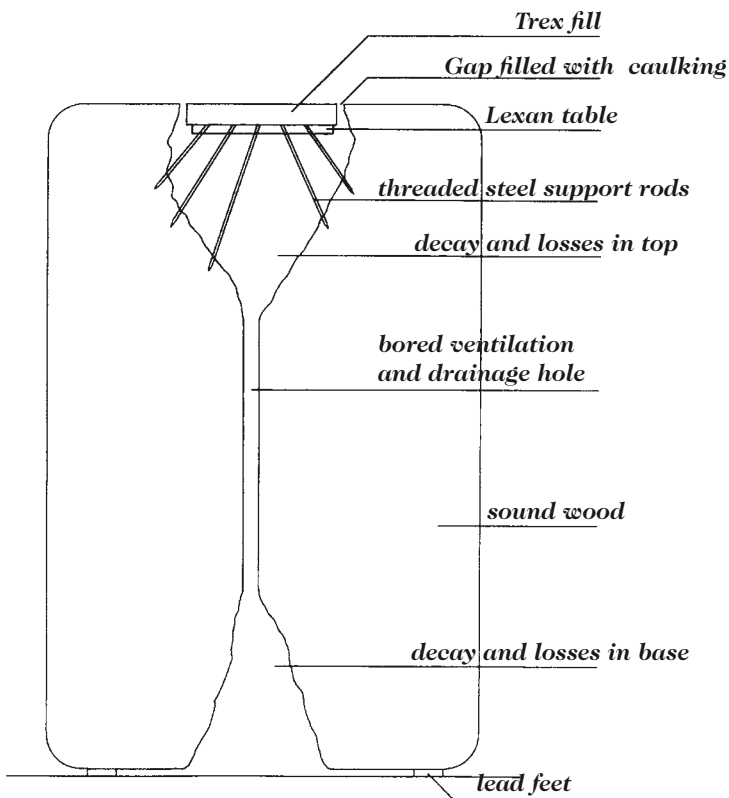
Diagram (not to scale) of cross-section view of a typical center block (≈ 6 ft. h. x 3 ft. w.) showing the decay and the arrangement of the fill and feet.
